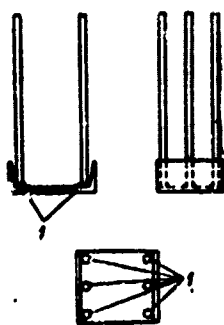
The anchoring of unstressed transverse rods by welding them to steel insert components
